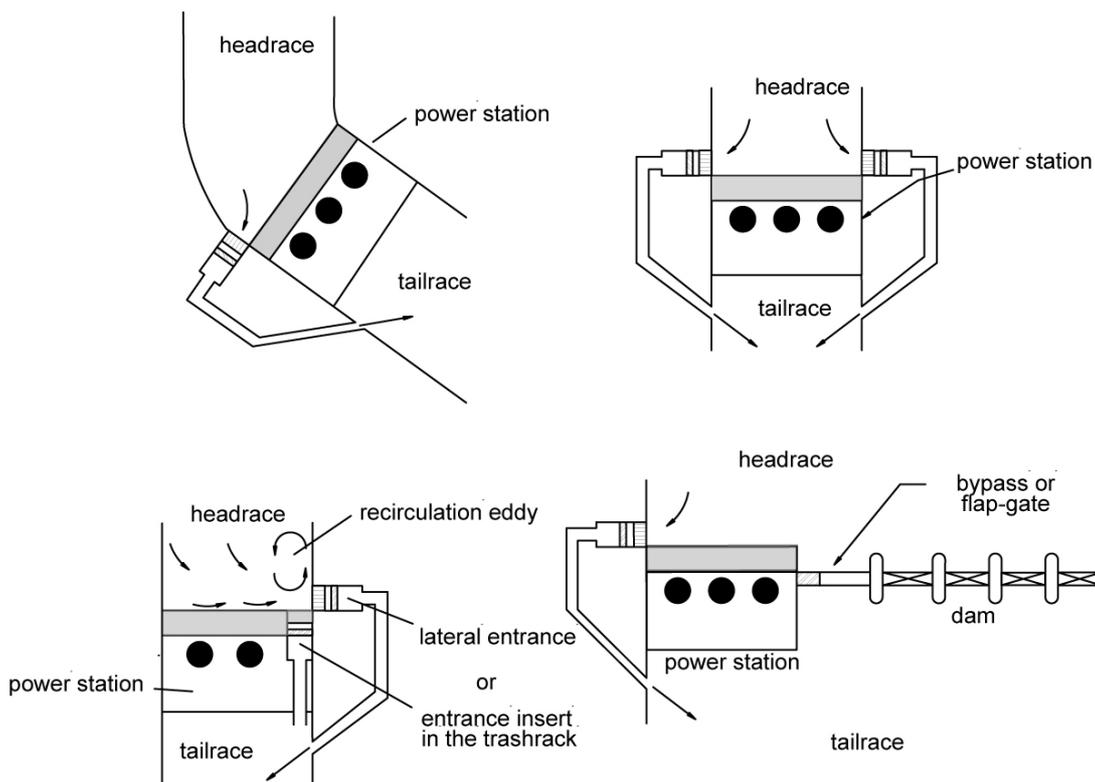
Conceptual plan of the location of downstream bypasses at hydroelectric plant intakes.
